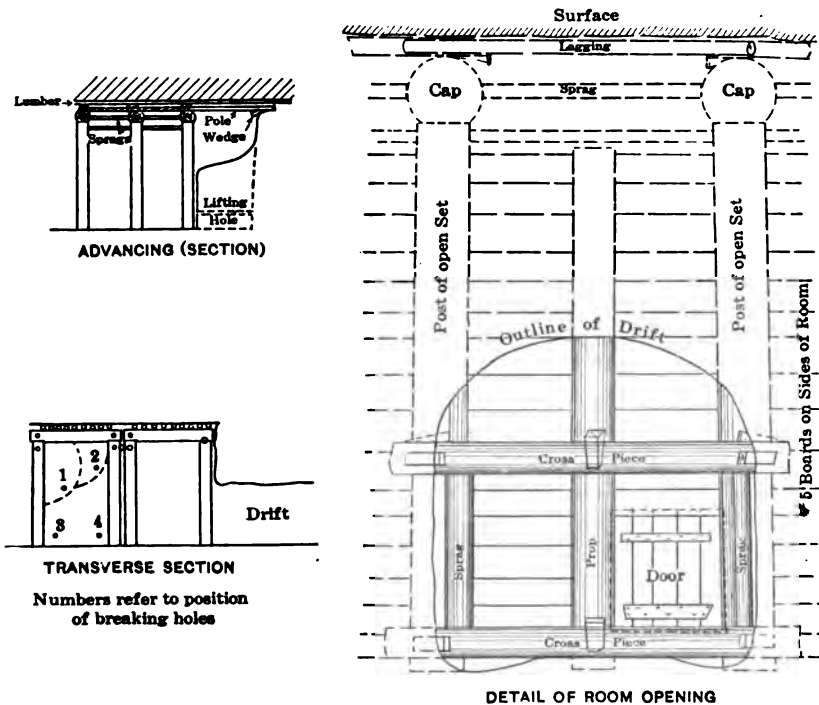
Details of support, top-slicing. (*Eng. and Min. Journal.*)
